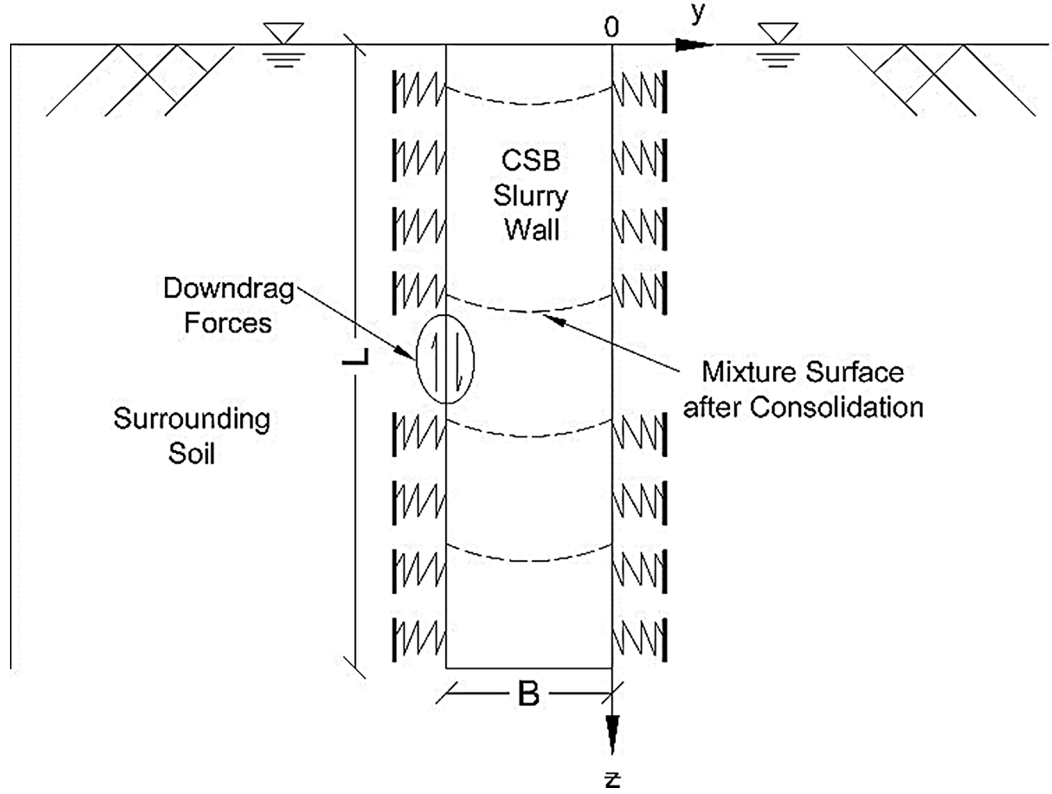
Schematic of the sidewall friction on the stress distribution in a CSB slurry wall.
